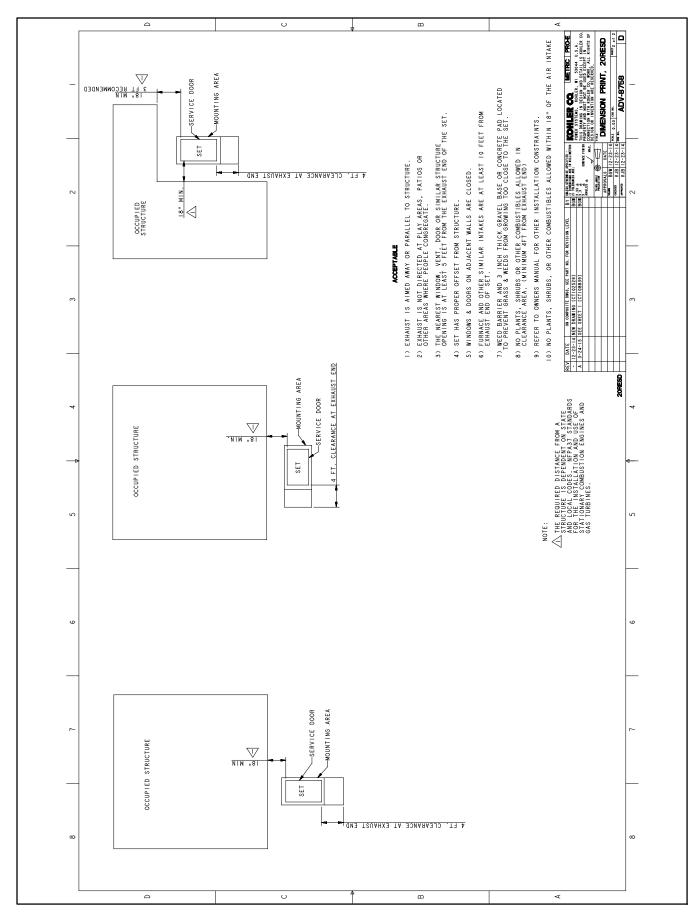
Dimension Drawing, Model 20RESD, ADV-8758, Sheet 2 of 2
